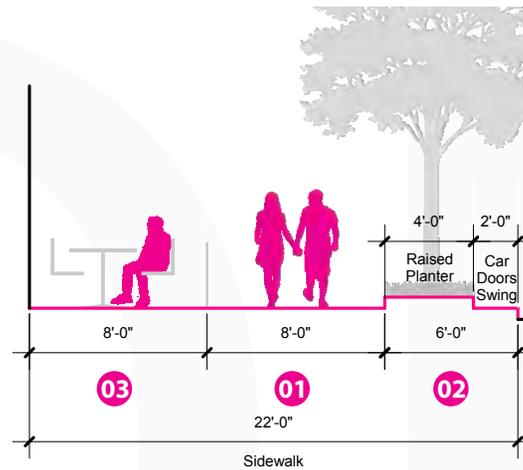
Sidewalk with expanded frontage zone for sidewalk cafe
